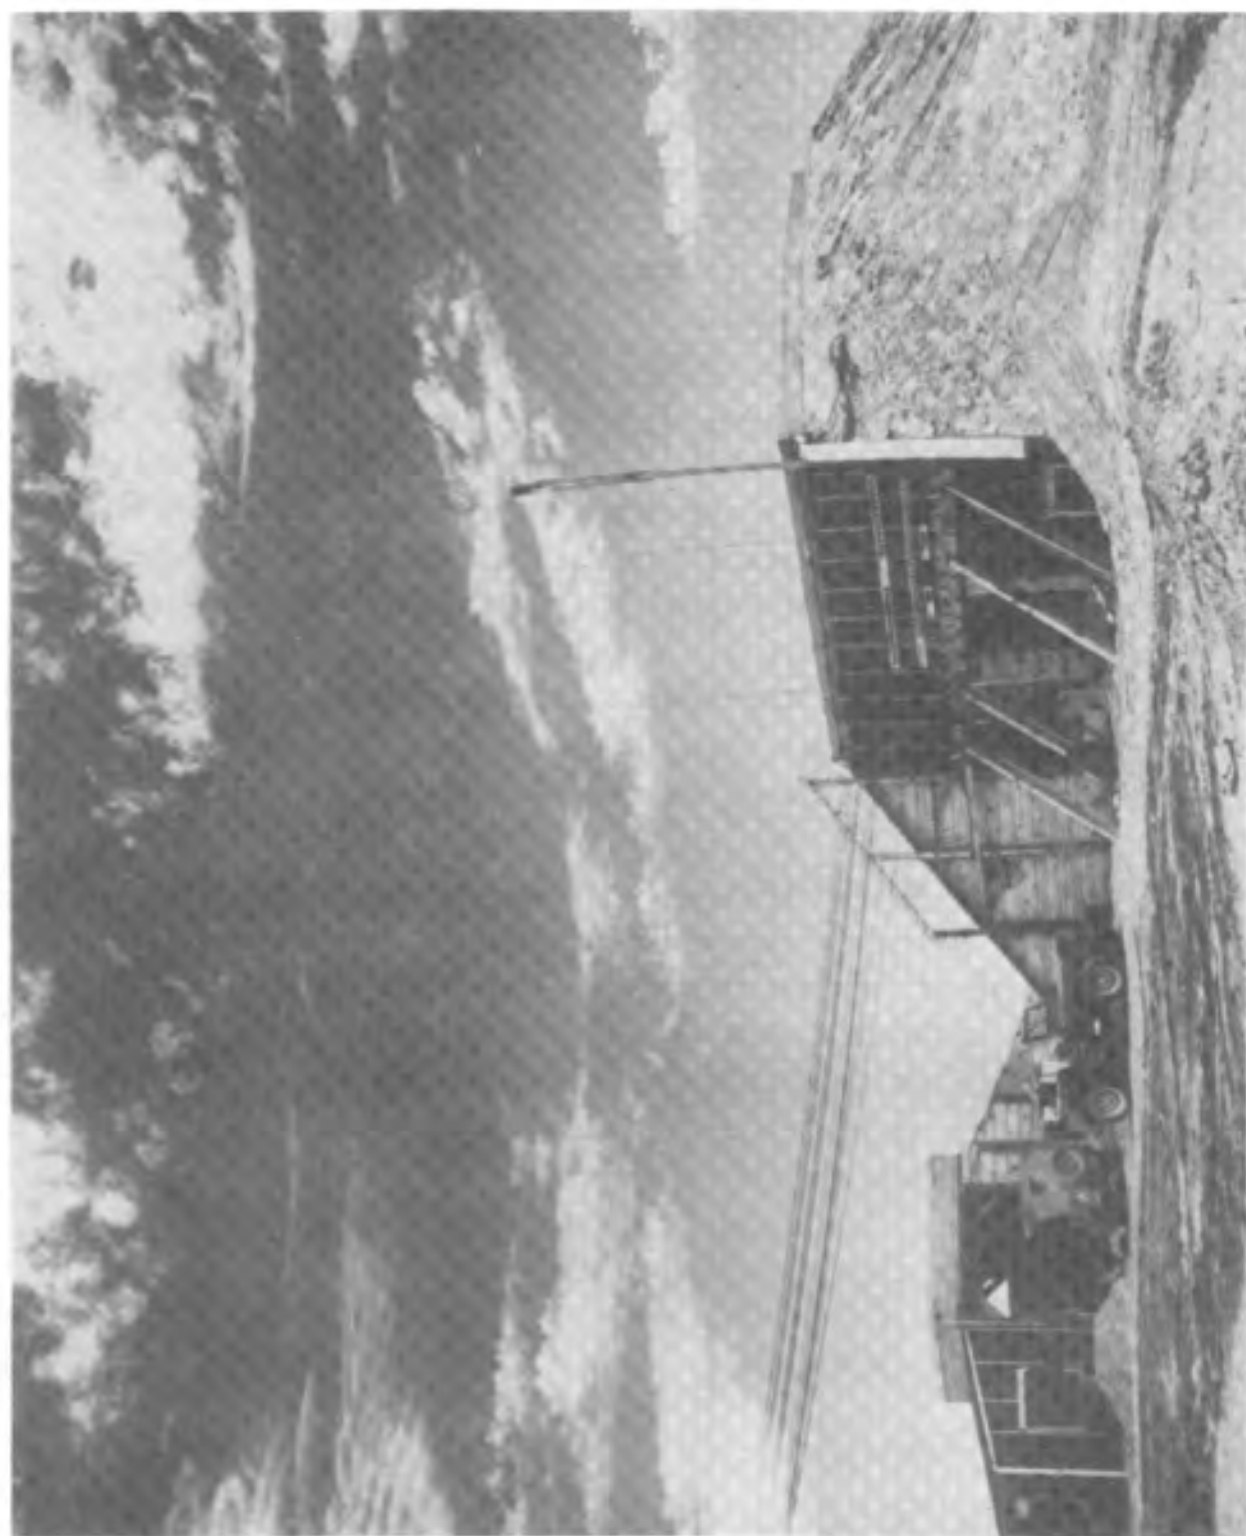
THE SOUTH SHELTER (CONTROL POINT)
